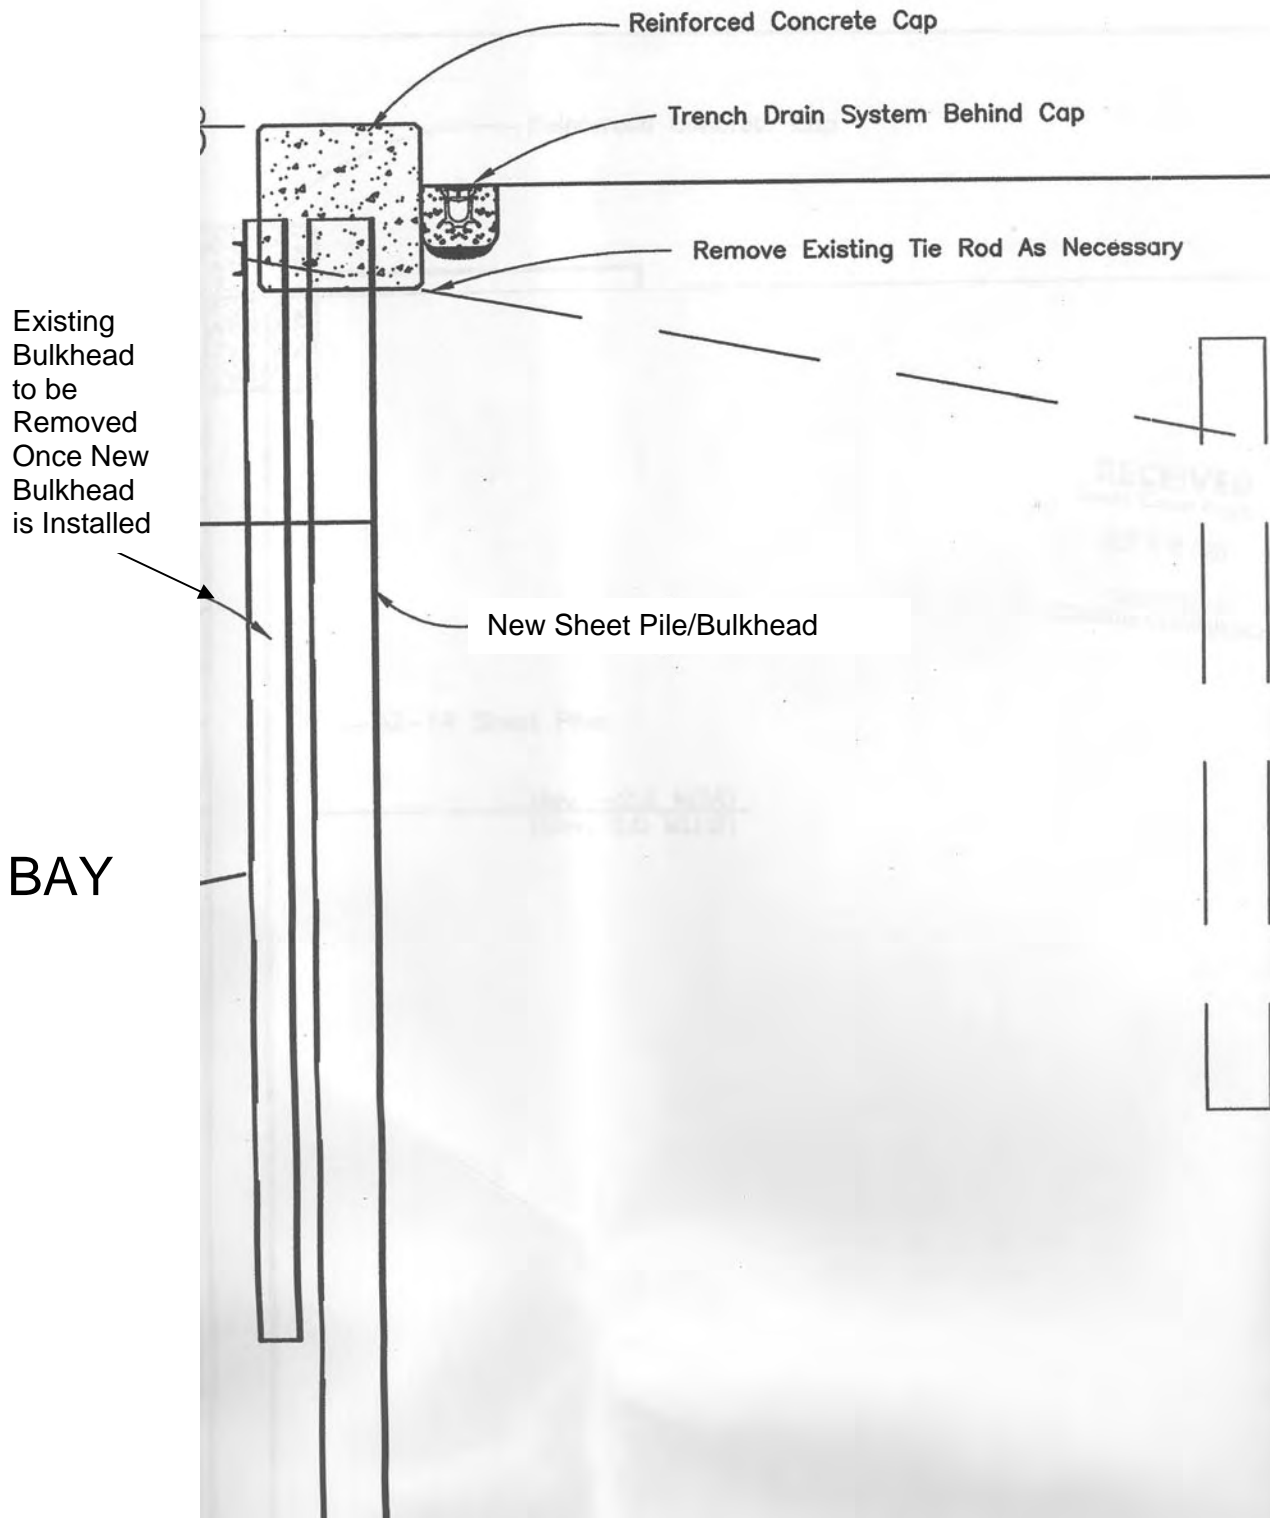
Proposed New Bulkhead Alignment for Area Depicted in Photo 9
